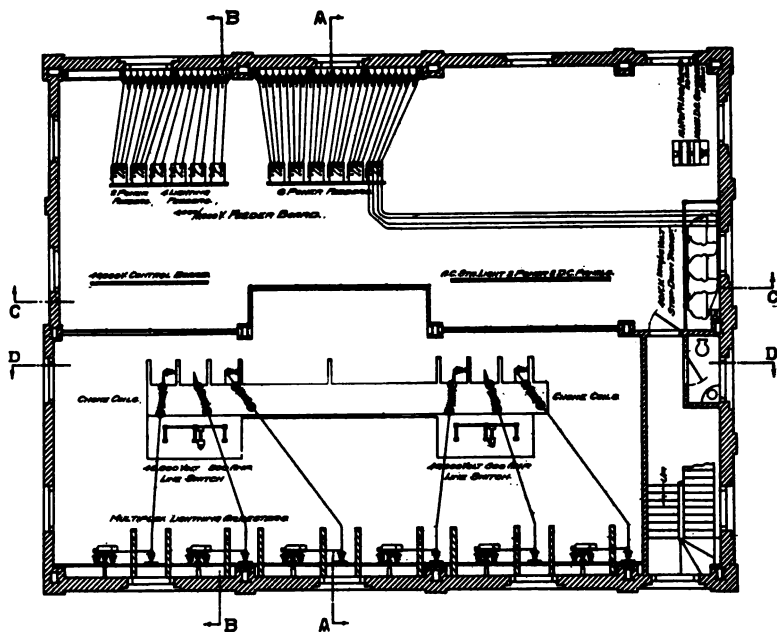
Gallery Floor Plan, Substation, Chattanooga & Tennessee River Power Co.
